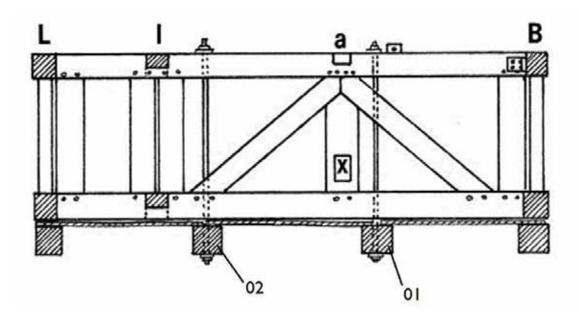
Drawing of one of the cross frames of bellframe showing its form, and also the foundation beams sampled for dendrochronology, adapted from original drawings by Pickford (2013)
